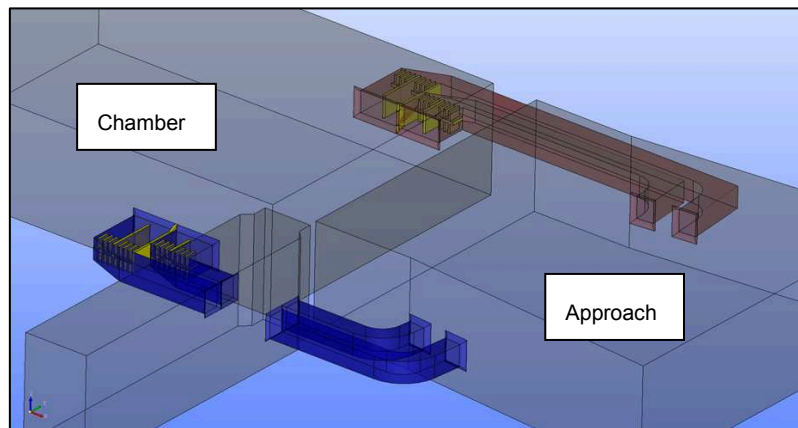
Canal side, lock head, south culverts connected to the gate recess
